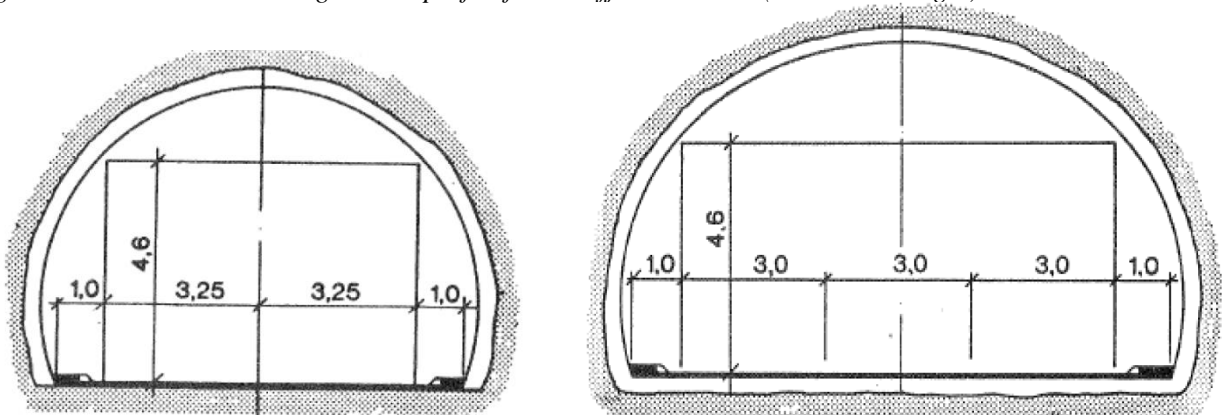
Principal lay-out of cross section of tunnel (unit: m).
